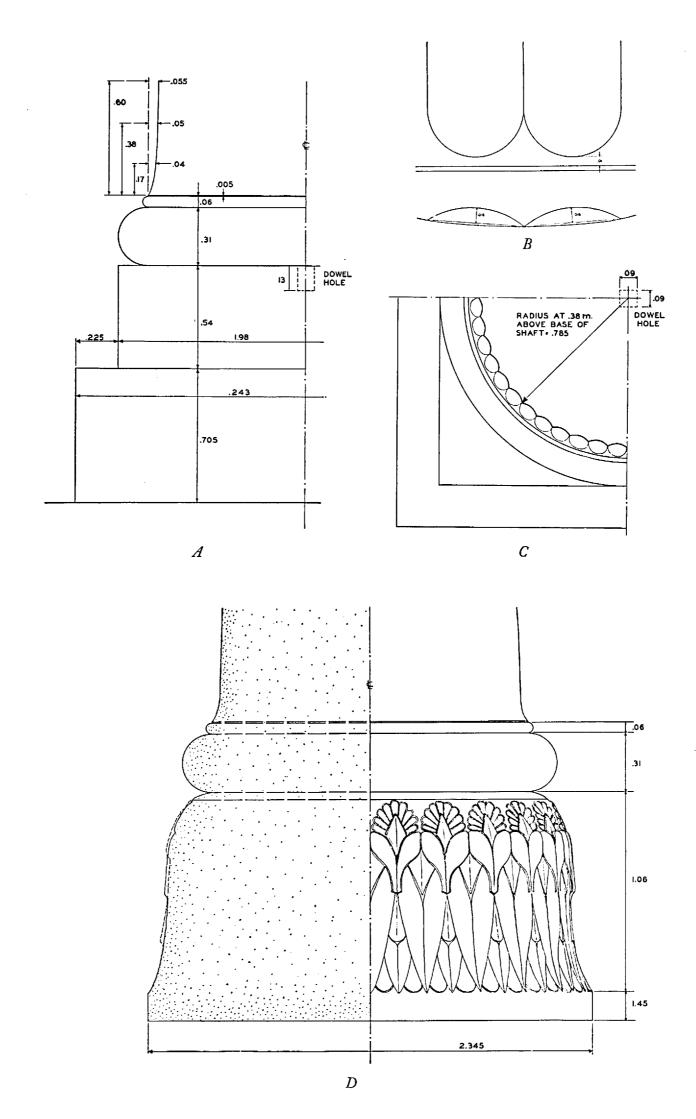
Apadana. A-C. Base and Lower Shaft of Column in Main Hall. Section, Elevation and Section of Two Flutes, Quarter Plan. D. Column Base in Eastern Portico. Section and Elevation. Scales, 1:20 (A, C, D) and 1:4 (B)
